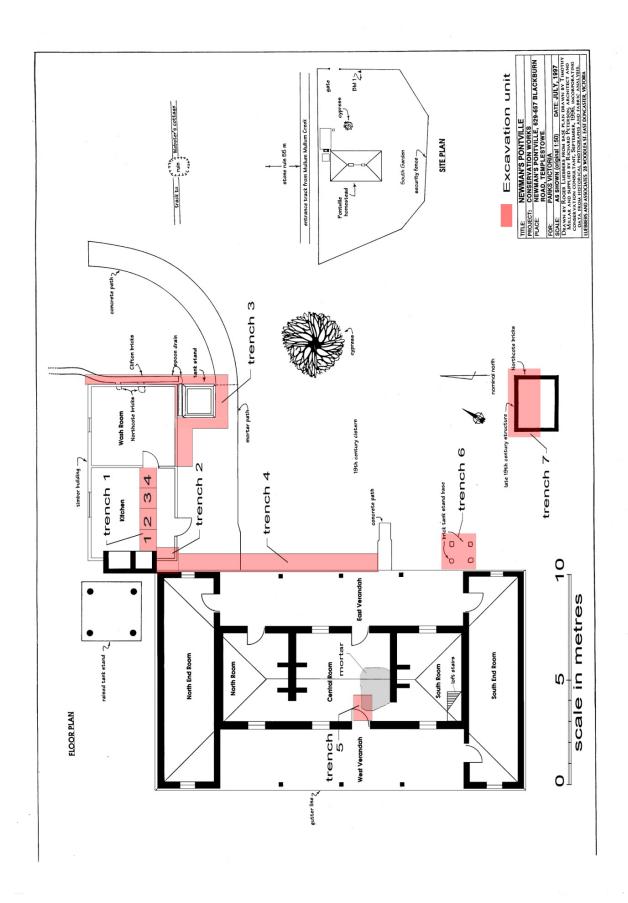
Plan of excavations units undertaken to examine sub-surface fabric at Pontville.
